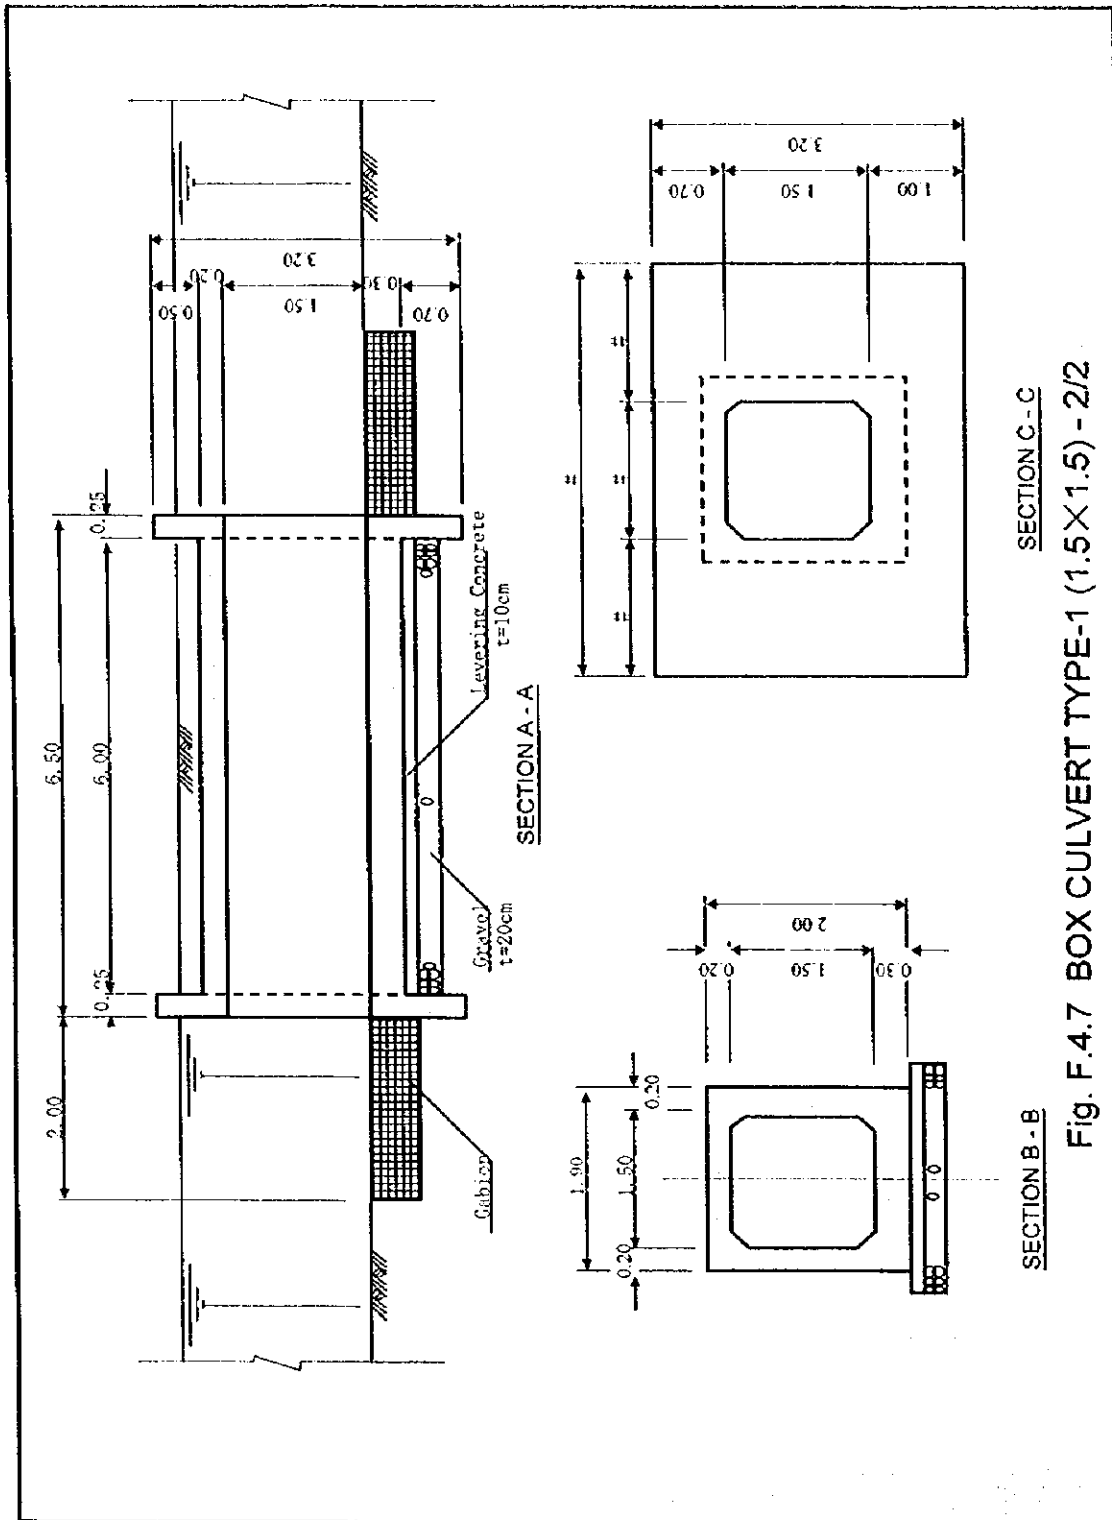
BOX CULVERT TYPE-1 (1.5X1.5) - 2/2
